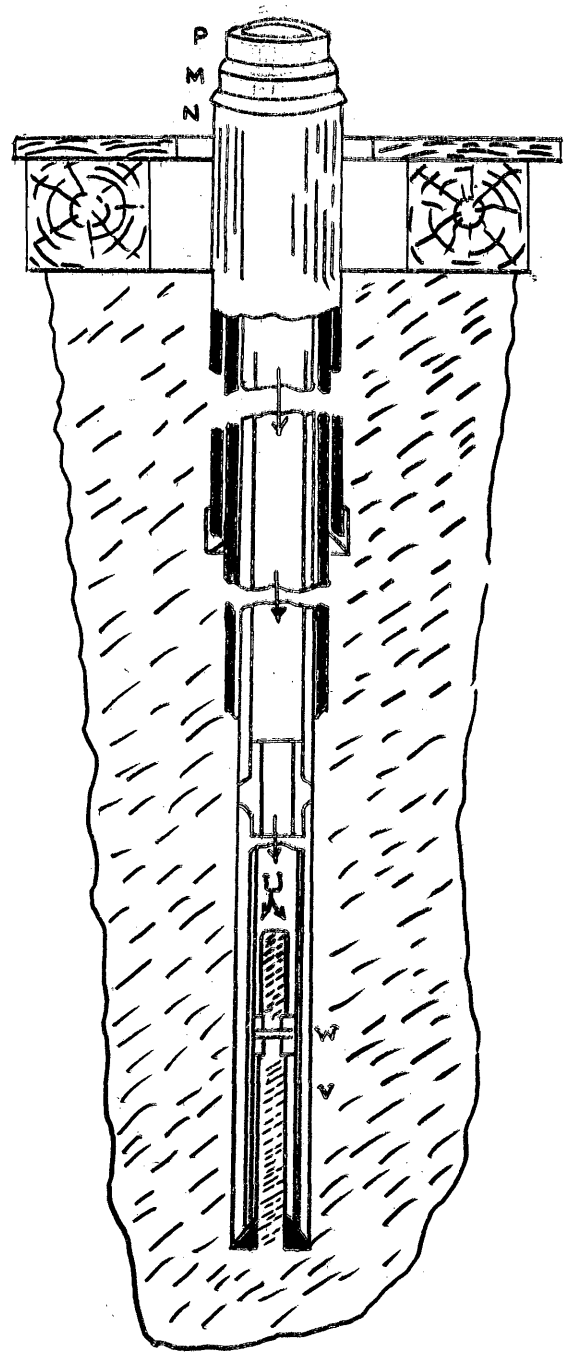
TYPICAL DIAMOND DRILL TOOL COLUMN
